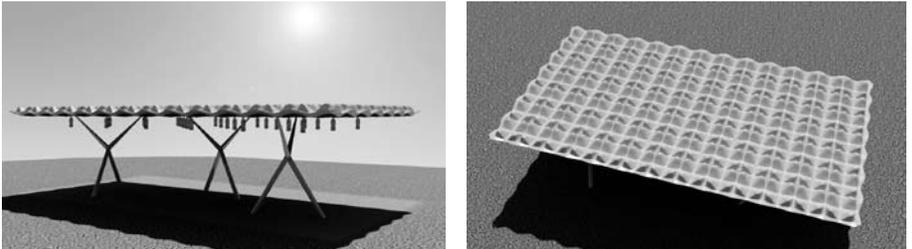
Perspective views of the pavilion: the roof and the pillars/roof in bird's eye view
